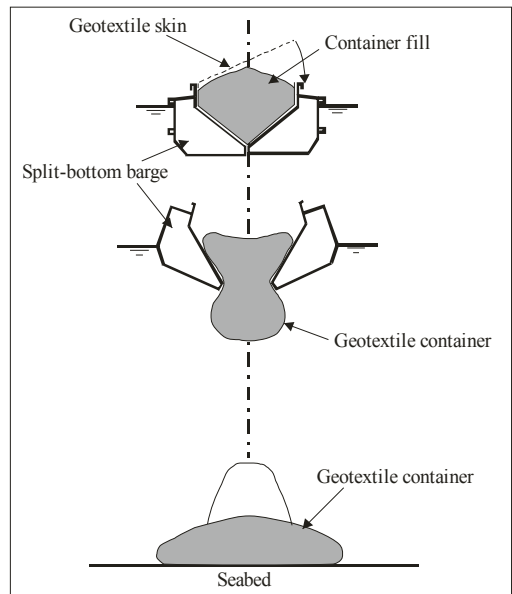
Installation procedure for geotextile containers (After Pilarczyk 2000).
